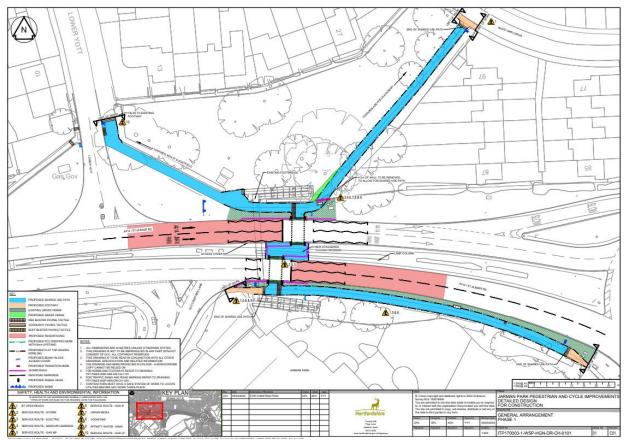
Jarman Park Toucan Crossing scheme drawing (HCC)
